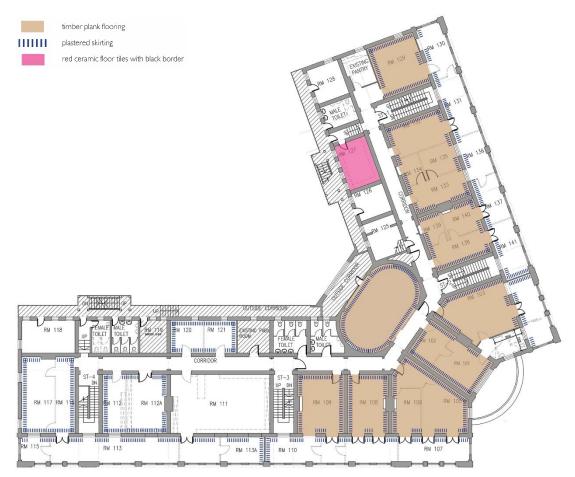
Timer plank flooring, plastered skirting and red ceramic floor tiles with black border on 1/F.
